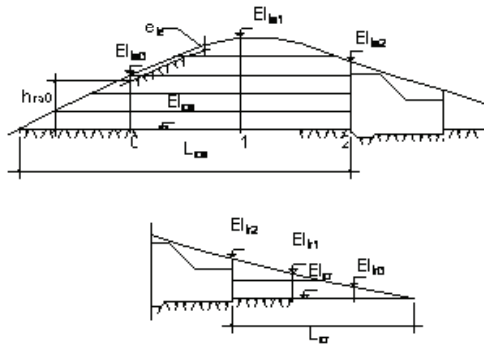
Excavation for approach and downstream channels.
